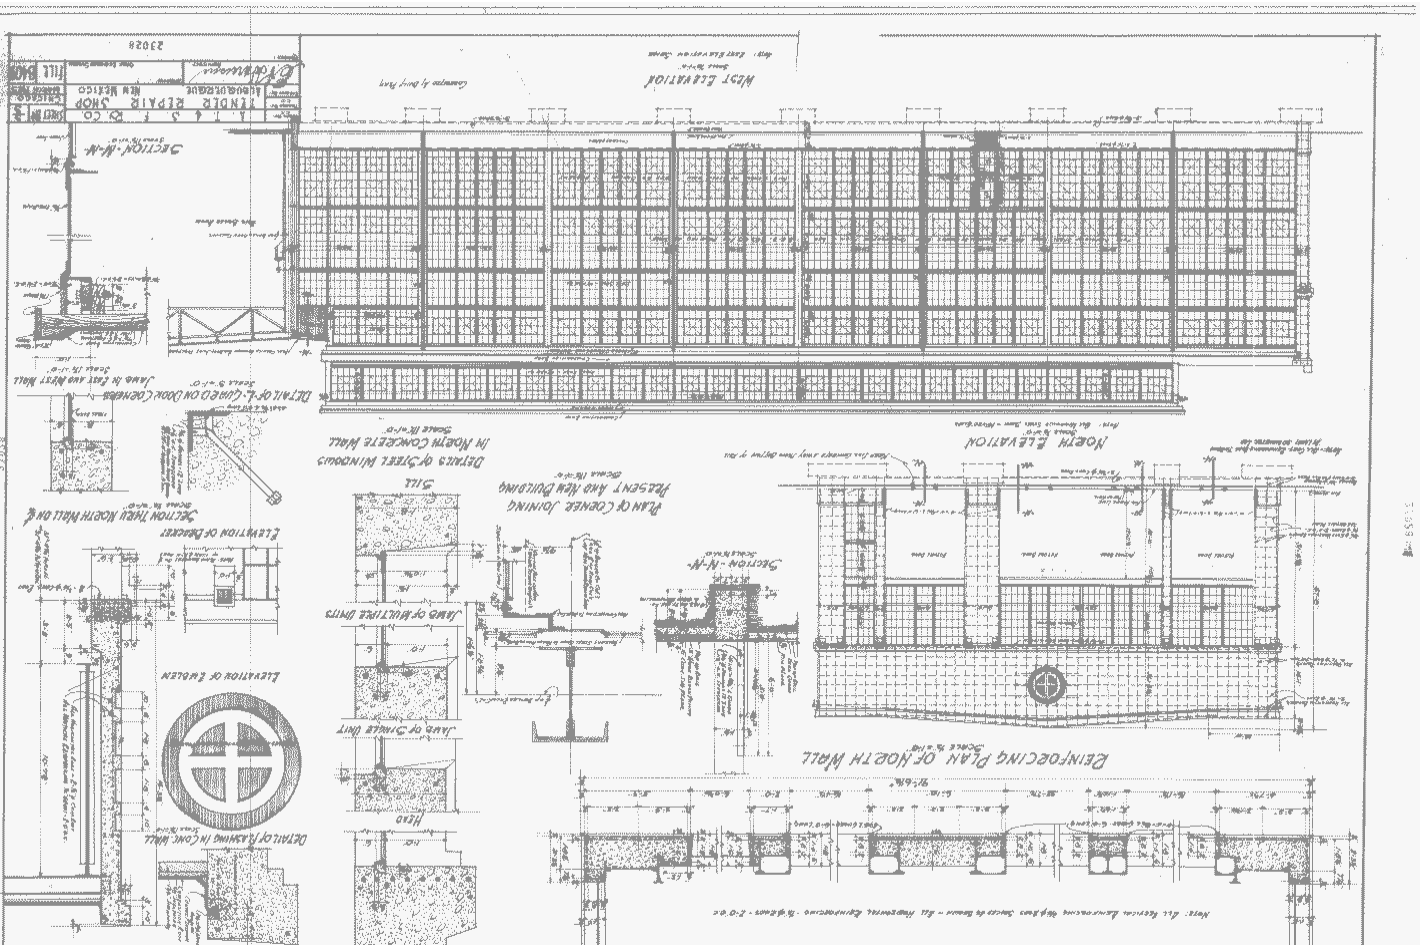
North and west elevations of the tender shop with concrete details. AT&SF Engineers, drawing c.1925
